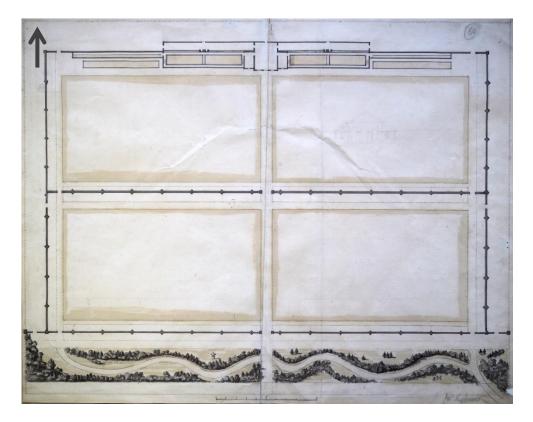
THE OUTLINE OF CONSTABLE'S STOVE GARDEN BY TIMOTHY LIGHTOLER, UNDATED, THOUGHT TO DATE FROM THE MID 1760S. THE PROFILE OF THE STOVE ON THE NORTH WALL FITS THAT OF THE DARKER SECTION ON THE 1767 PLAN (FIGURE 7) (BURTON CONSTABLE HALL, AUTHOR)
